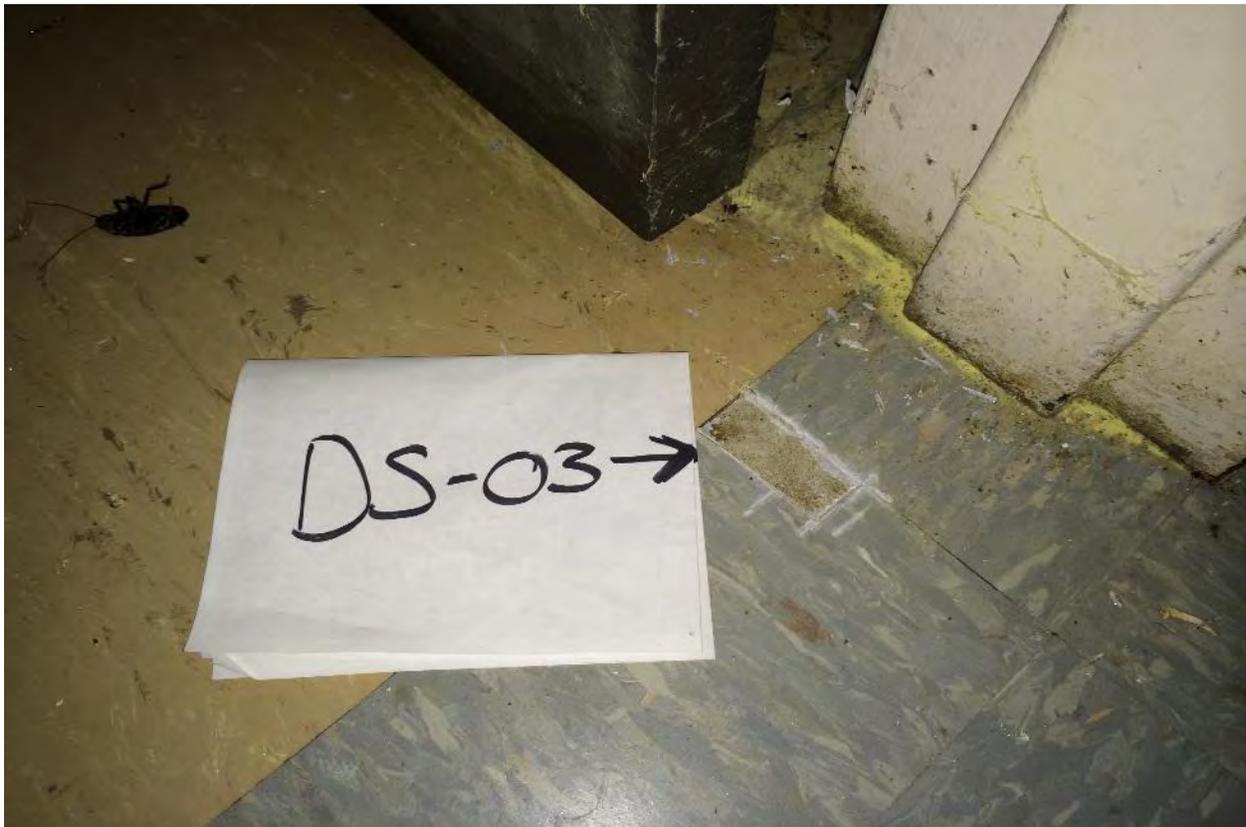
Laboratory analyses did not detect asbestos minerals within the blue floor tile or mastic sample DS-03 collected from the Dormitory Building upstairs central room.
